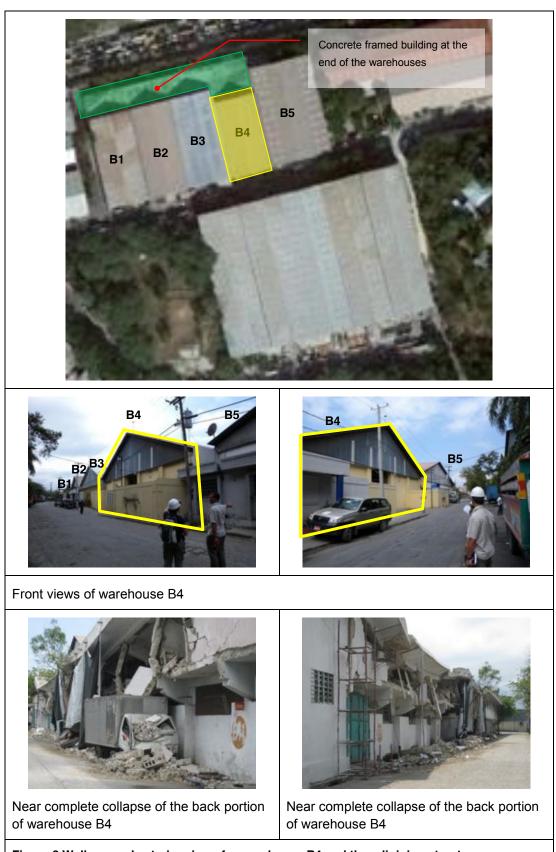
Walk around views of the warehouse H2 and the adjoining structures.
